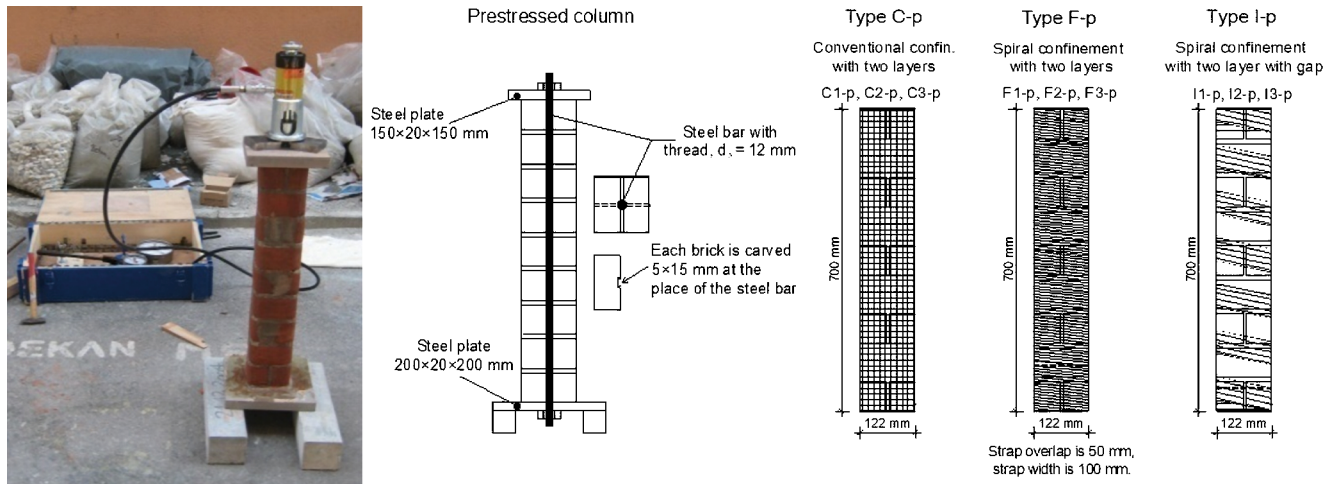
Specimens which were exposed to compressive load (prestressing) during confinement
